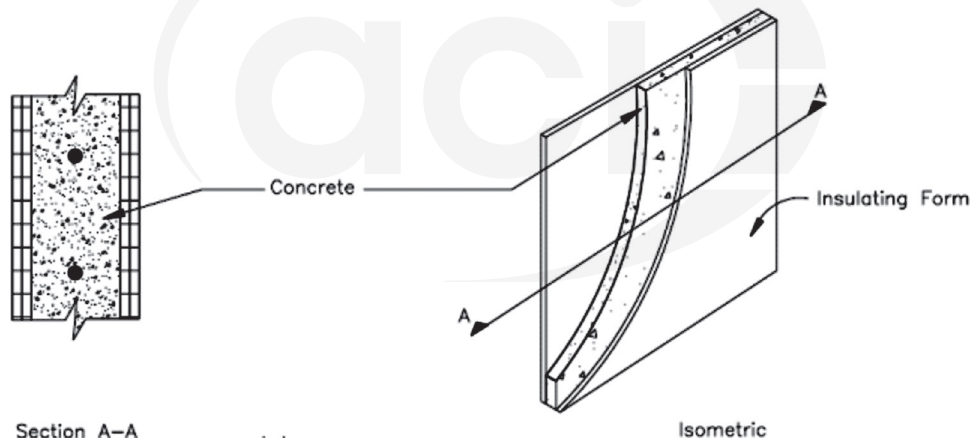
Flat wall ICF wall system and plan view Section A-A.
